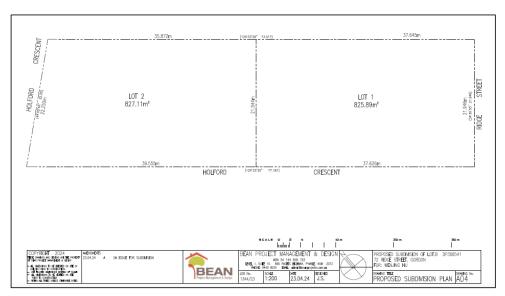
Proposed Subdivision Plan (Bean Project Management and Design, 2024)
